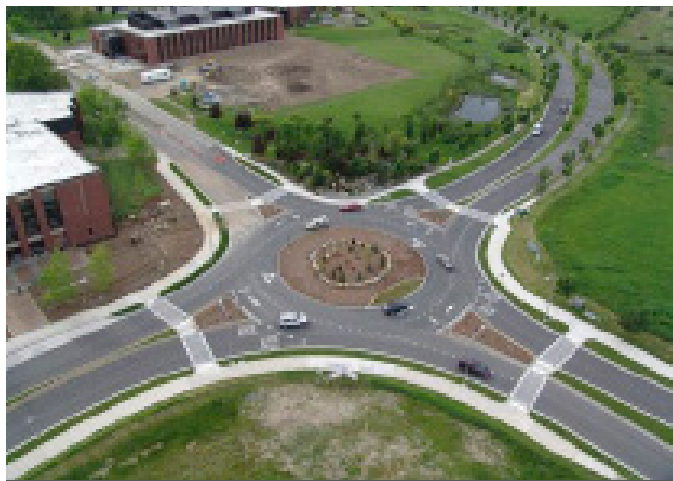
Typical Layout of Separated Bike Lanes at Roundabout
